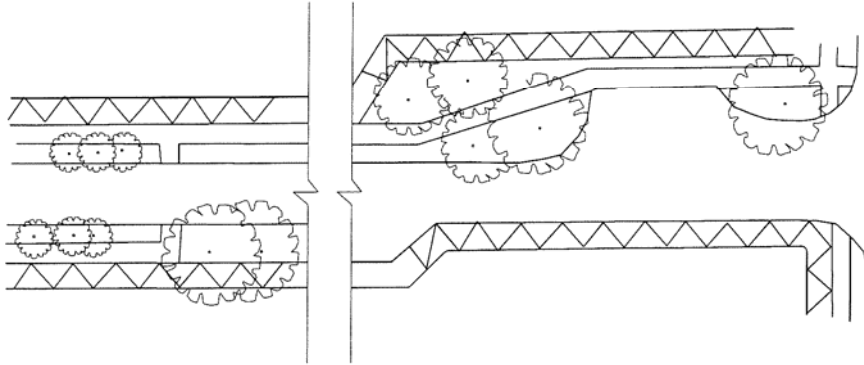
PLANTING FOR NON-STANDARD ROAD DESIGN
